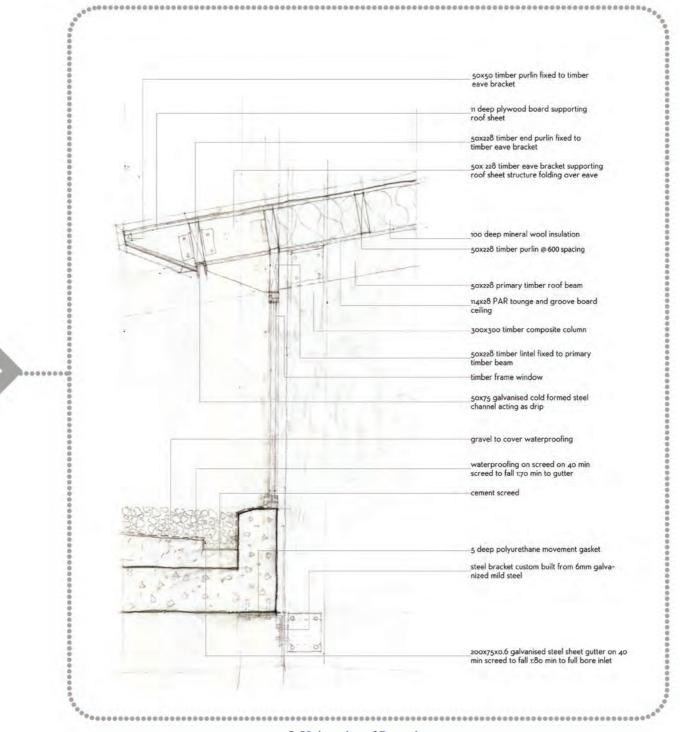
and 7.31 show eave details of the timber roof structure. The aim of the first iteration
